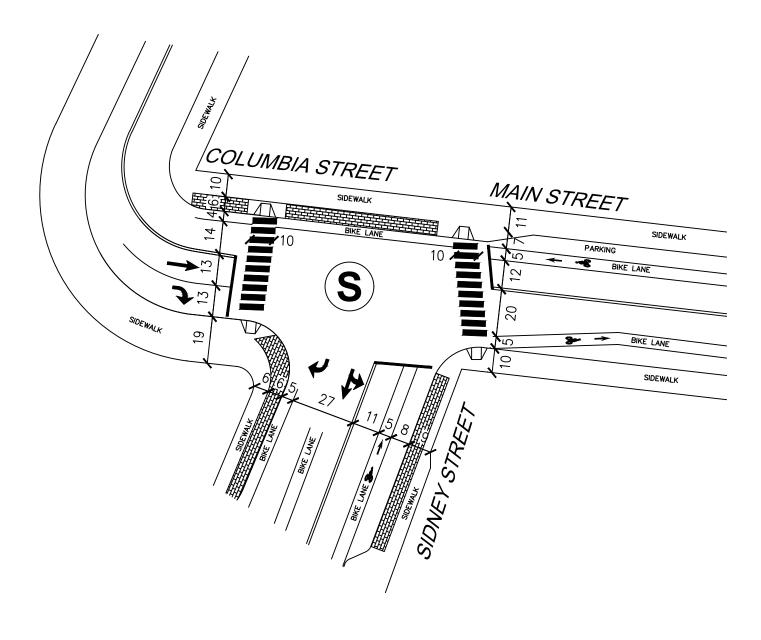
b.3 Existing Conditions Intersection Sketch Columbia Street at Main Street/Sidney Street
